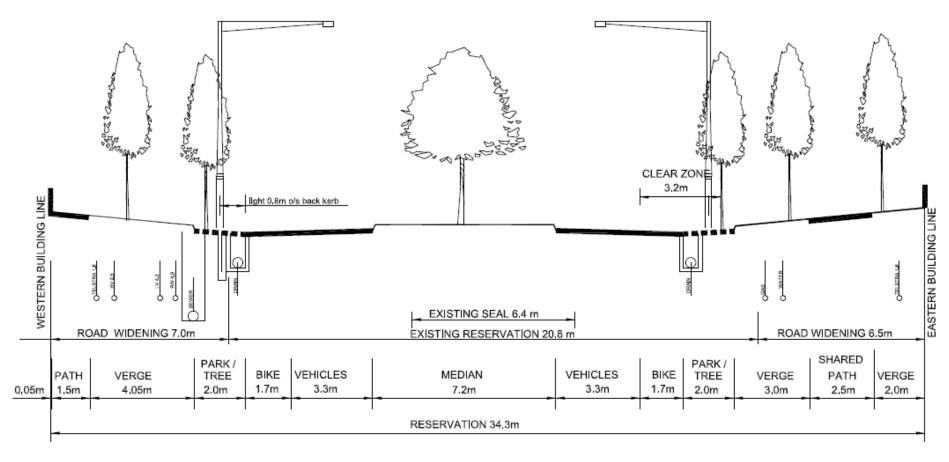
Cross-section Horseshoe Bend Road (Connector Street Level 2)
